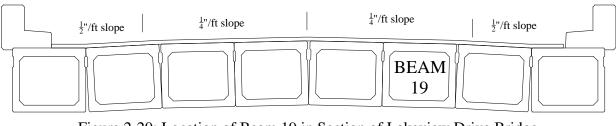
Location of Beam 19 in Section of Lakeview Drive Bridge
